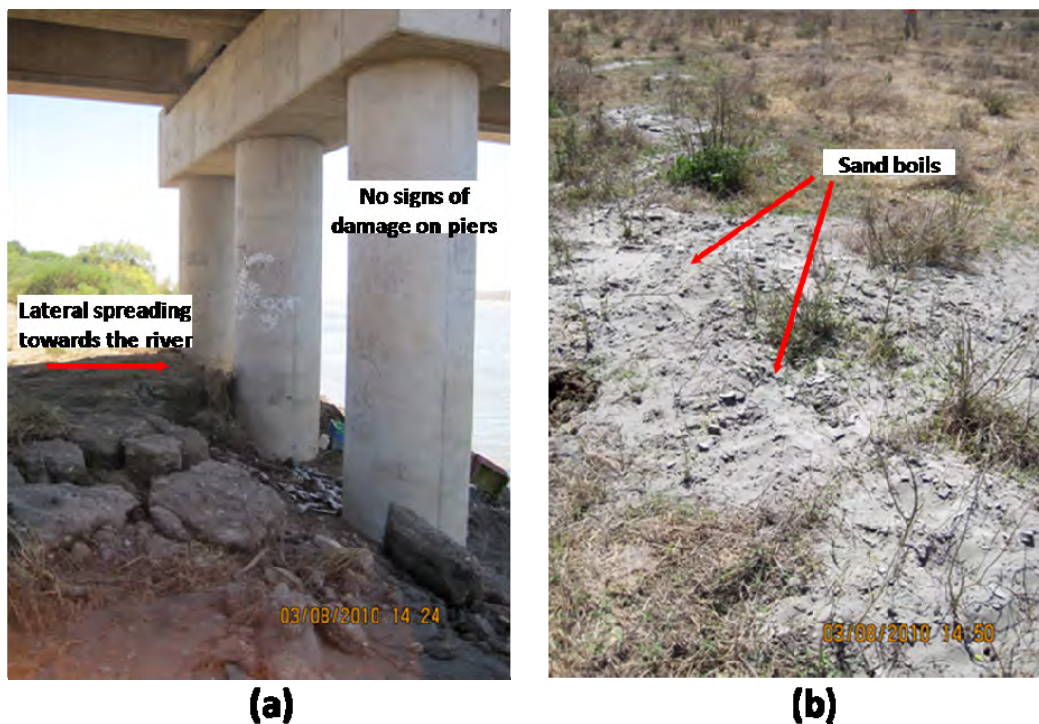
Mataquito bridge-(a) Blocks of soil crust against piers at the south end, (b) Sand boils at the north end of the bridge (S35.051961, W72.163217; 1450 hrs on 3/08/2010)
